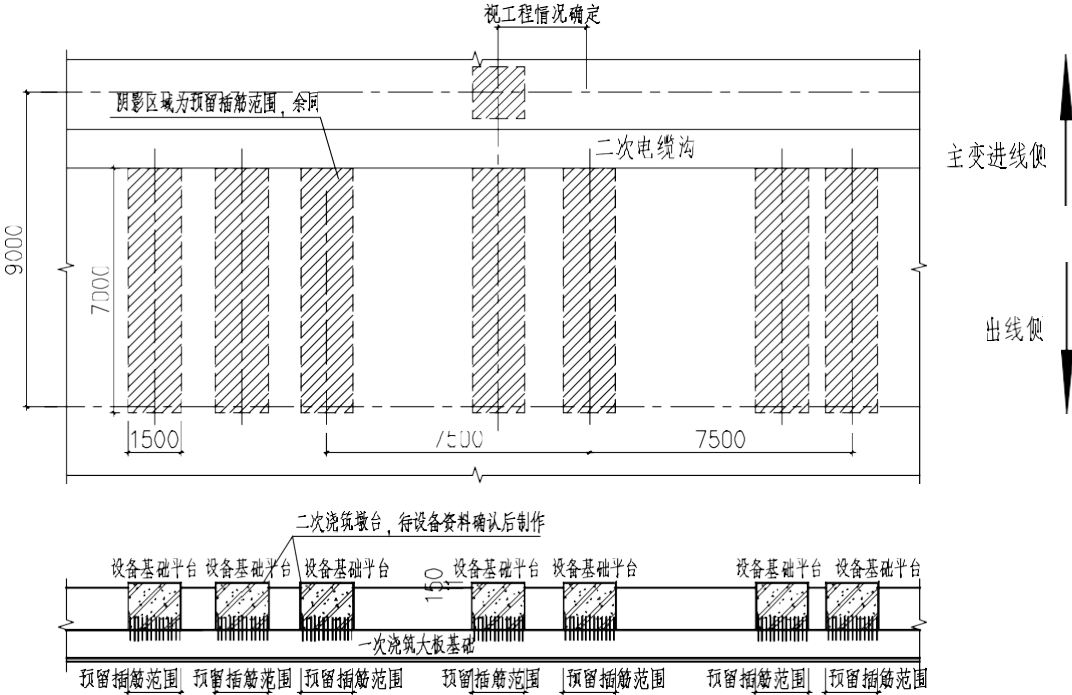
145kV outdoor GIS scheme (for double busbar connection, single busbar connection) foundation plan and section diagram (generic equipment number 1GIS-2000/40)
